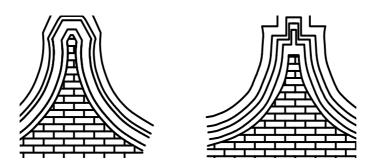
Elevated gable walls in houses in Taiwan, which have been inspired by Fujian and Gunangdong styles (Source: Drawn by author from Chen, 2008: 177)
